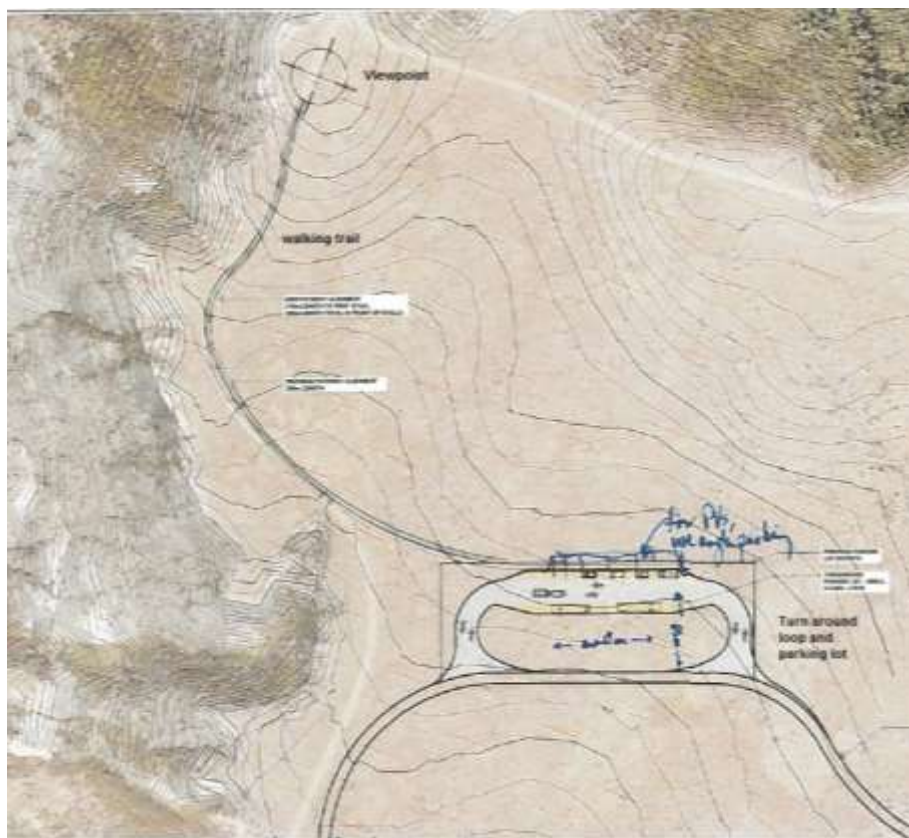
Proposed turn-around loop and parking lot at viewpoint 3
